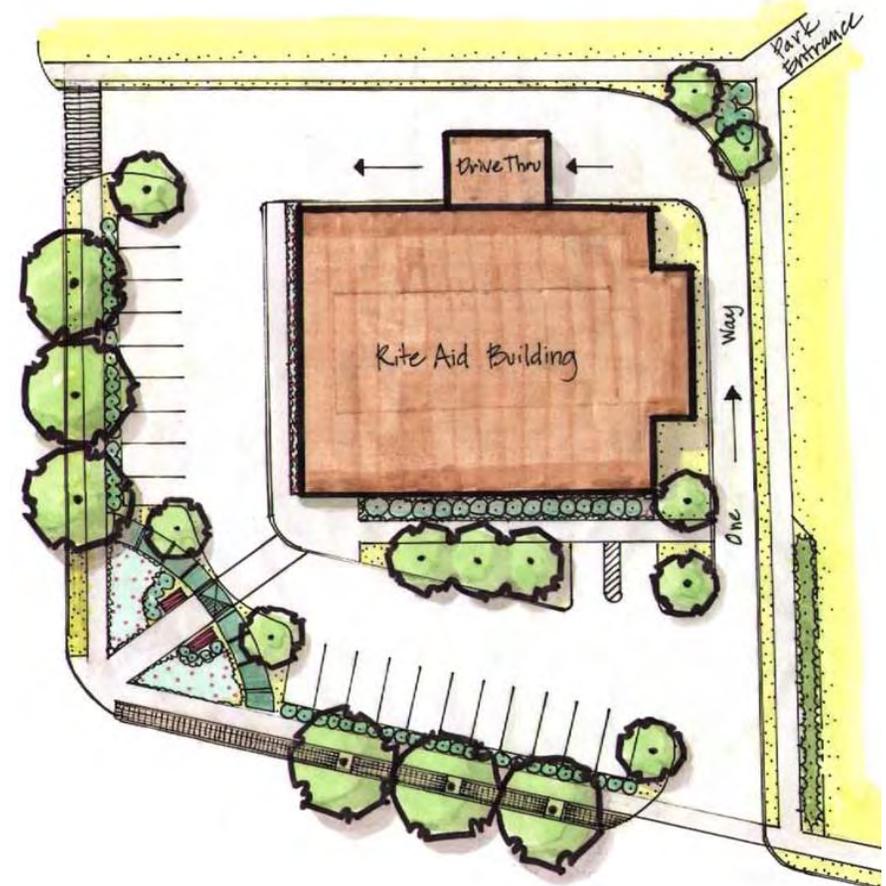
Site Plan for Rite Aid illustrates the focal point featuring a pergola structure modeled after the curving coal trestle that once existed in the railroad yard. The new plan includes a walkway along the north and east property lines that provide easy connections to the Cambridge Valley Athletic fields. As mitigation for providing these improvements, the pharmacy might be allowed to construct a drive through.
